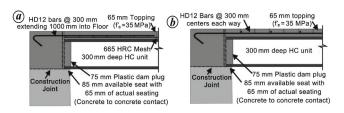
Connection details of test specimen³⁸: *a*, HCW1; *b*, HCW2.
